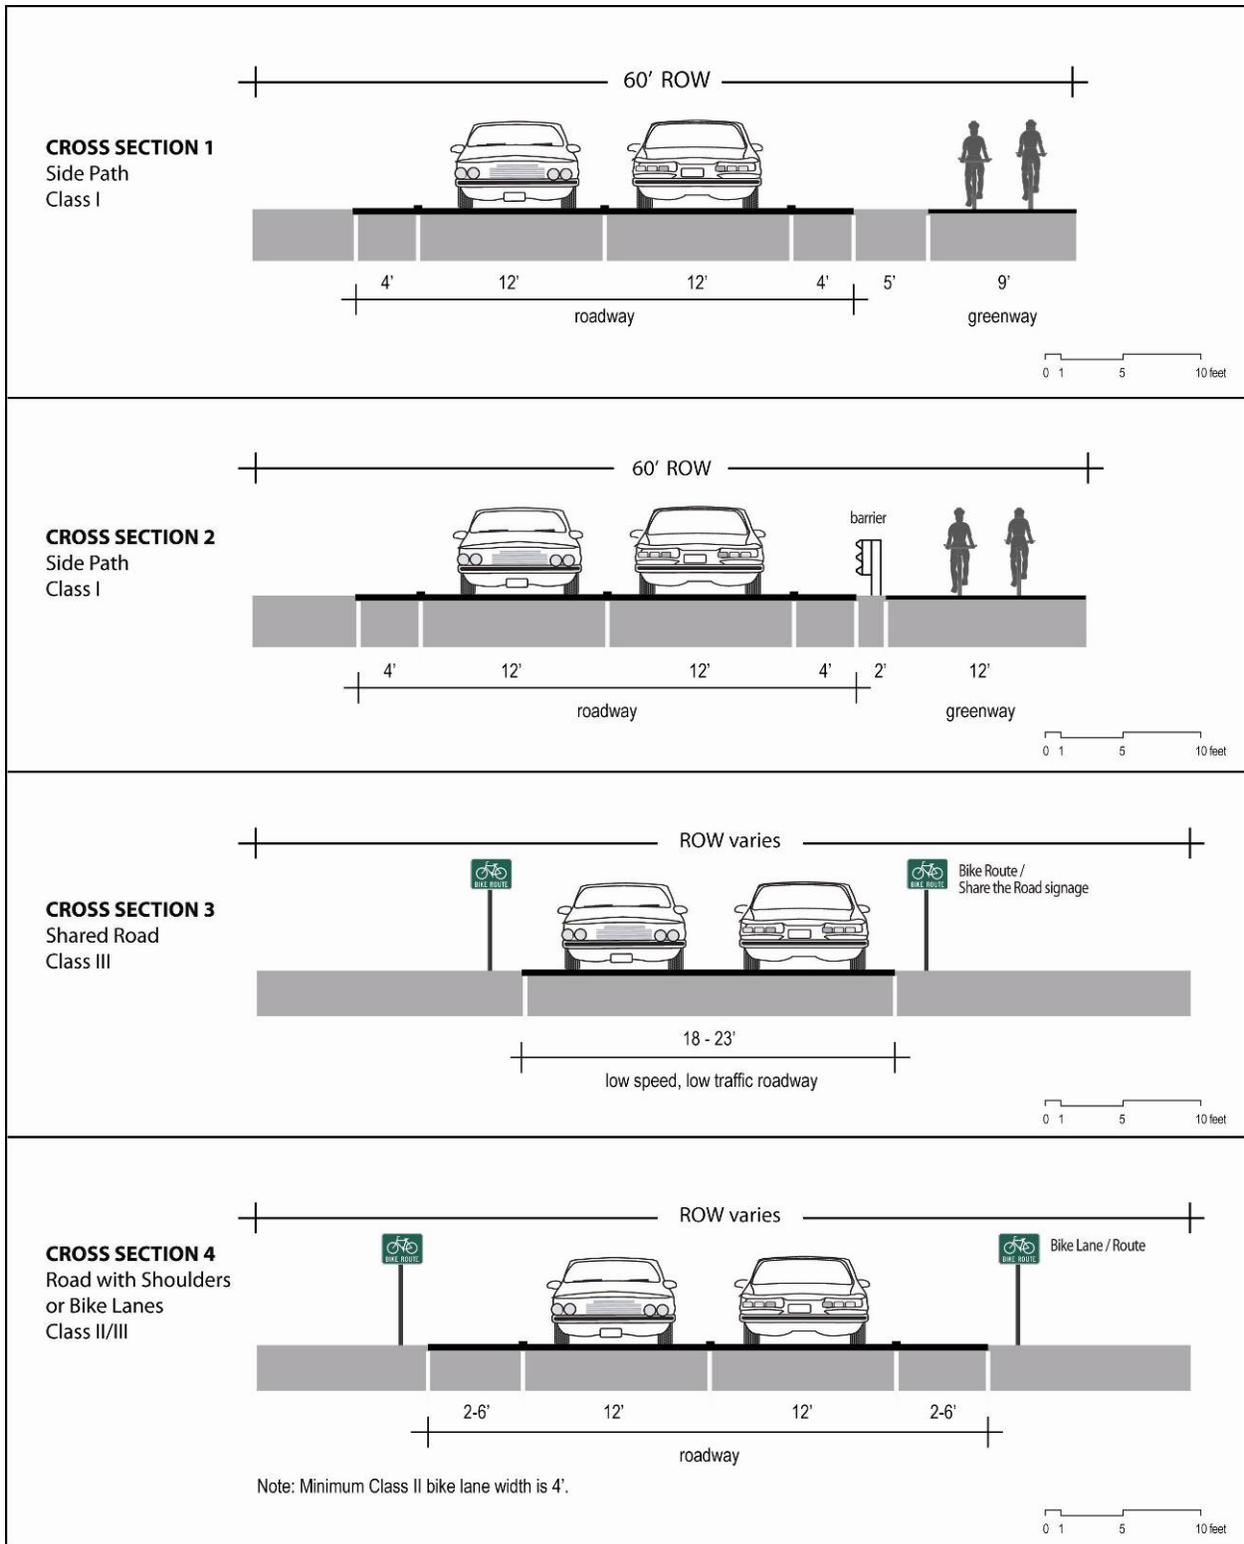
Typical Greenway Cross Sections: Roadway Corridors
